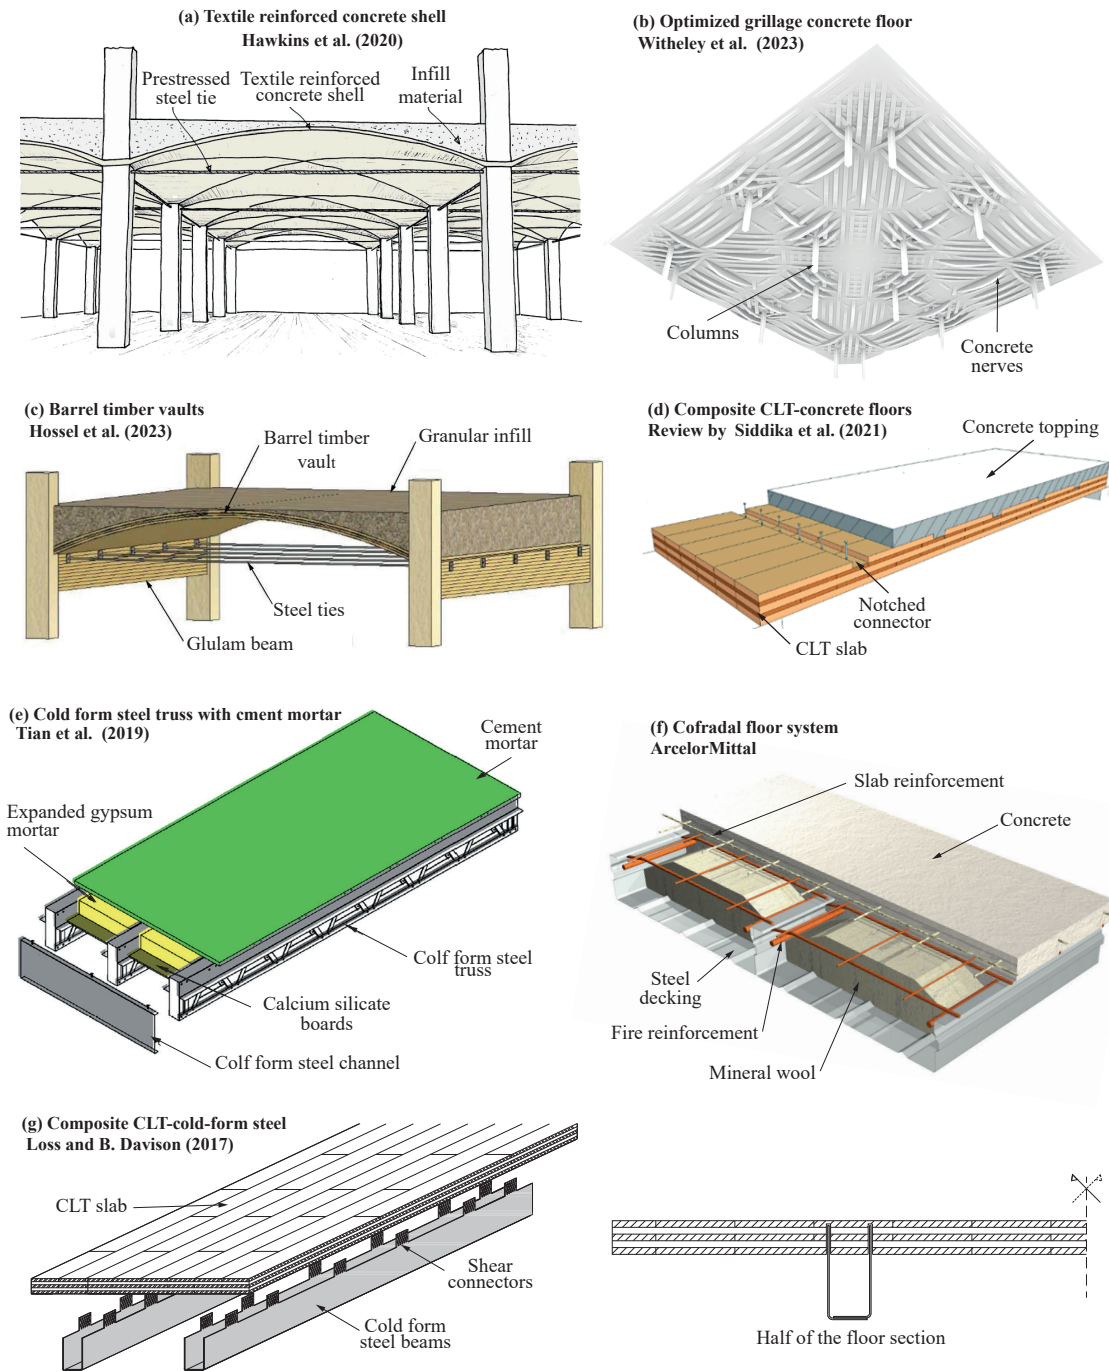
Recent innovations in lightweight floor systems. (a) Textile reinforced concrete shells [11]. (b) Optimized grillage concrete floor [15]. (c) Barrel timber vaults [13]. (d) Composite CLT-concrete floors [17]. (e) Cold-form truss floors [14]. (f) Cofradal system [16]. (g) Composite CLT-cold-form steel [18].
